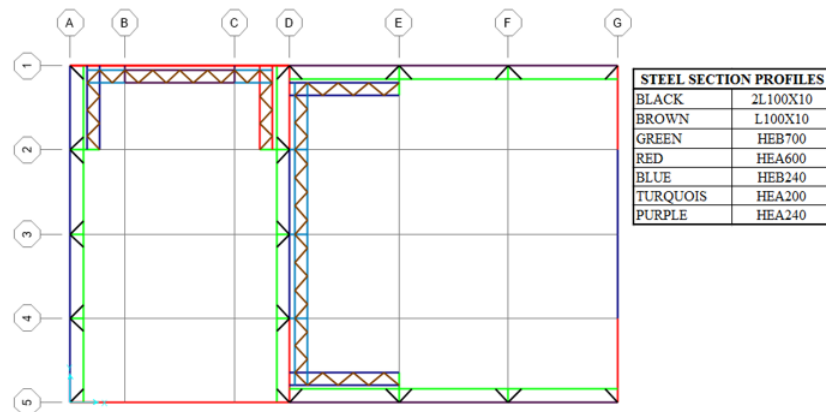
General Layout of the Crane Level with Steel Sections.
